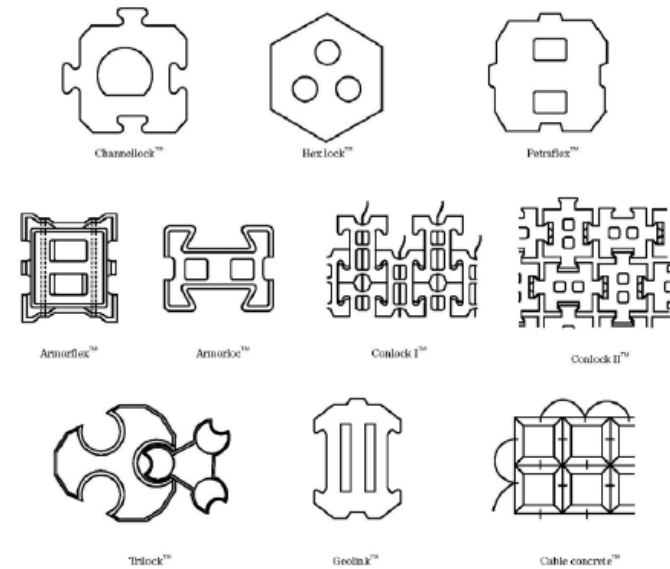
Common examples of precast concrete revetment systems. (NRCS, 2007).
